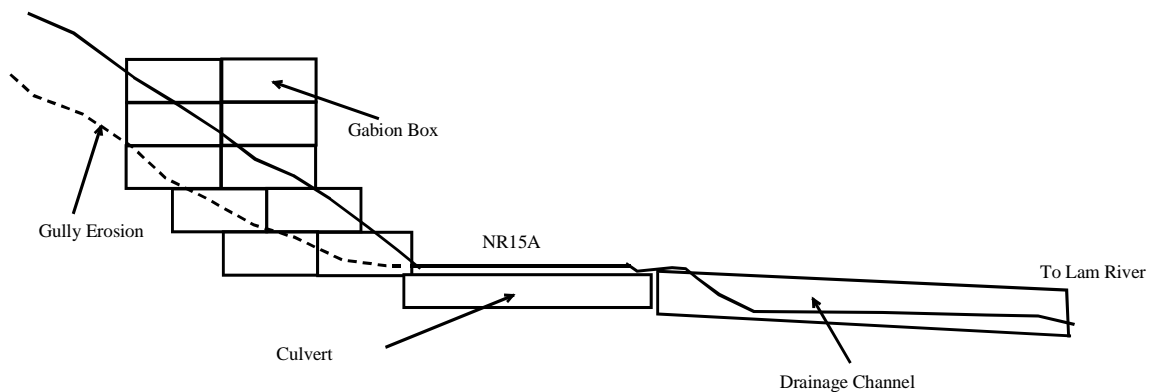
Cross Section of Gully Erosion Countermeasure
